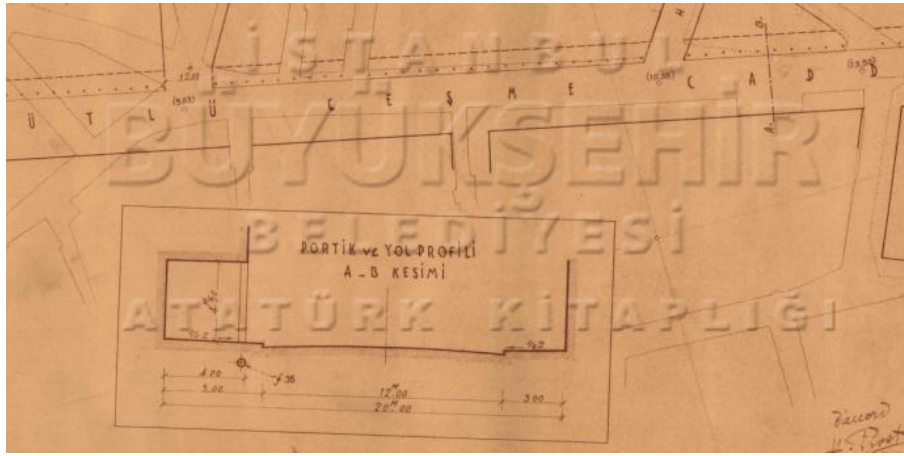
The portico section's detail in the plan of Kadıköy, Söğütlü Çeşme Street drawn by Henri Prost, 1940 (URL-3)⁹
